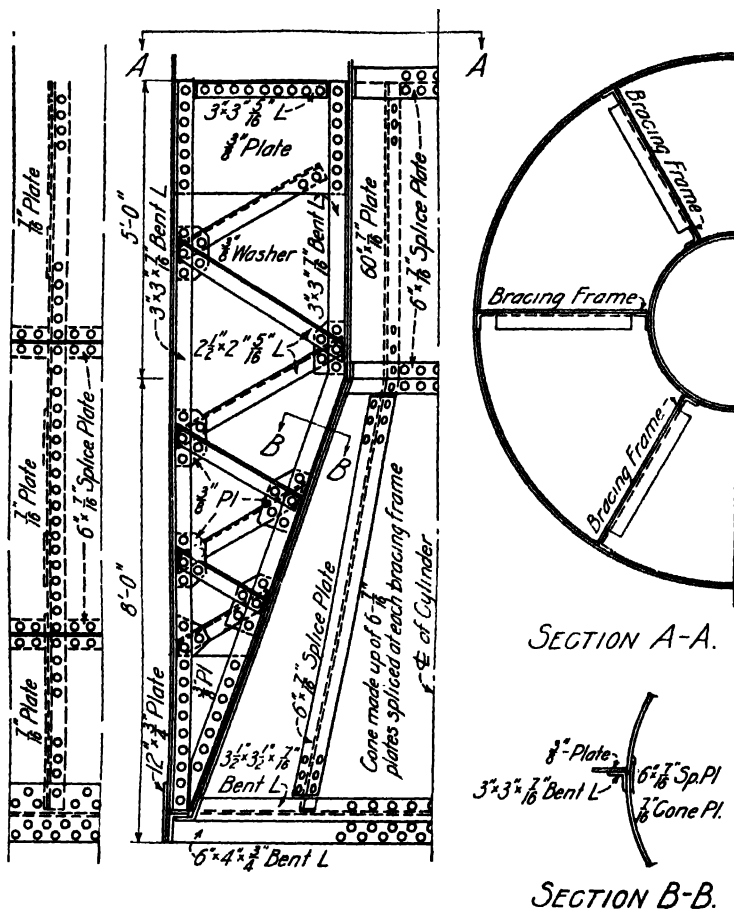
Details of Pneumatic Caisson for a Steel Cylinder Pier.
